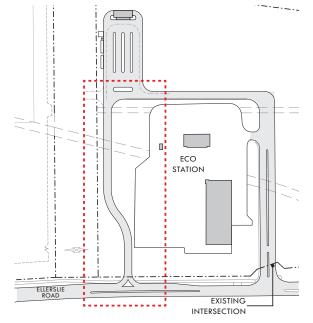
Secondary access road with direct access to Ellerslie Road
